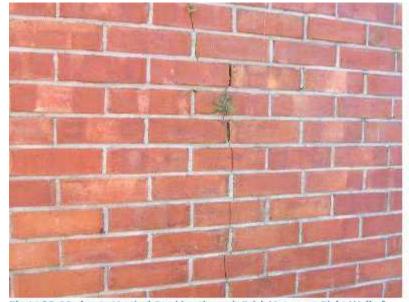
Moderate Vertical Cracking through Brick Veneer at Right Wall of Flat 7 (Photo 2 of 5) Looking Southeast
